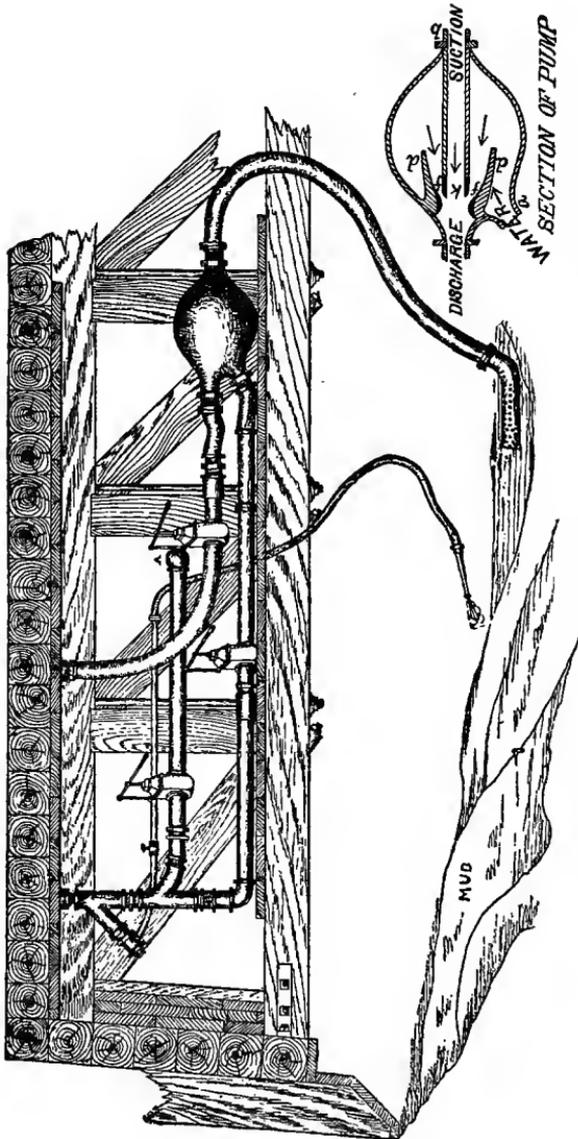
INTERIOR VIEW OF PNEUMATIC CAISSON OF HAVRE DE GRACE BRIDGE.
